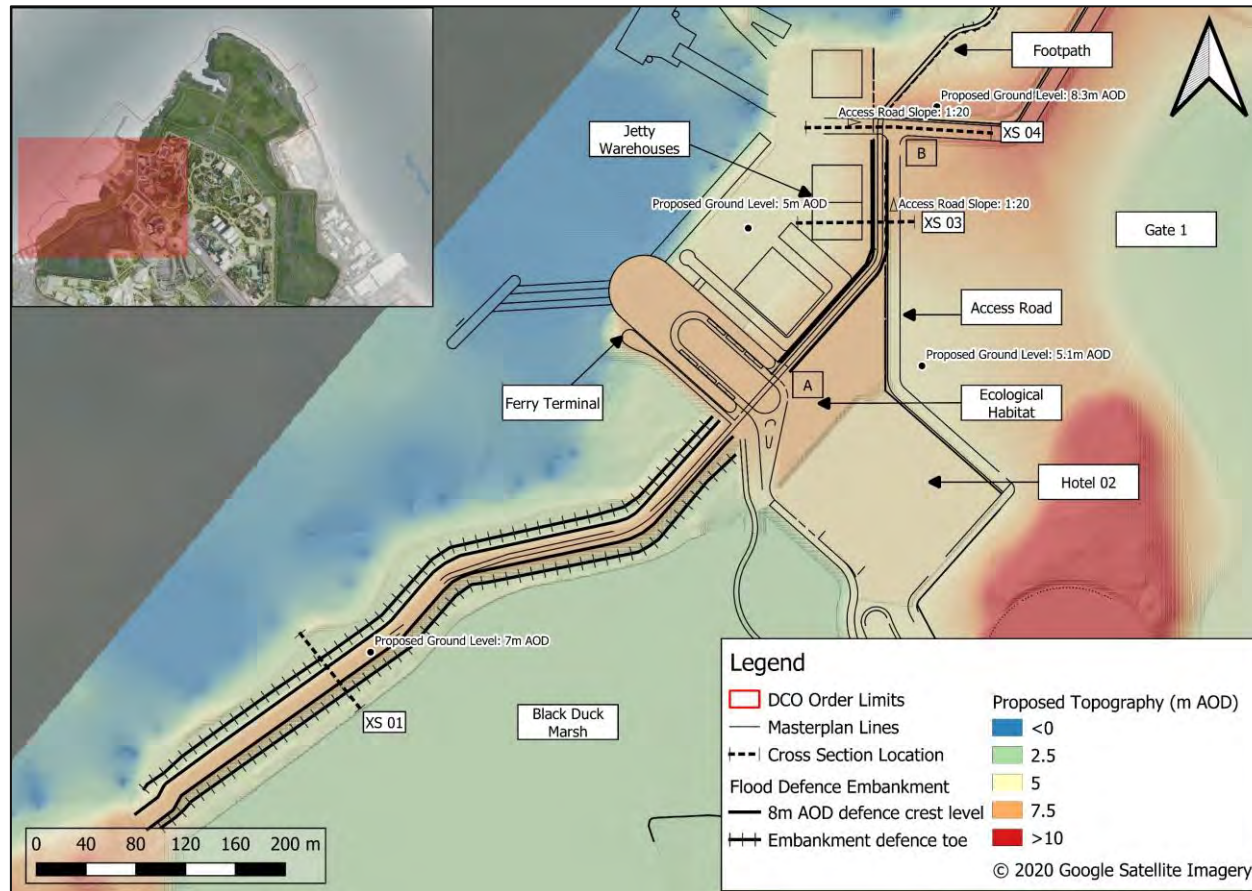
Spatial plan of showing indicative location of proposed flood defence crest, toe and raised land levels against proposed topography. This is to achieve recommended TE2100 Plan flood defence SoP to 2125. At location A and B access roads that cross the embankment to access the Ferry Terminal and Whites Jetty respectively will be appropriately ramped up to meet the required crest level whilst maintaining the appropriate gradients.
